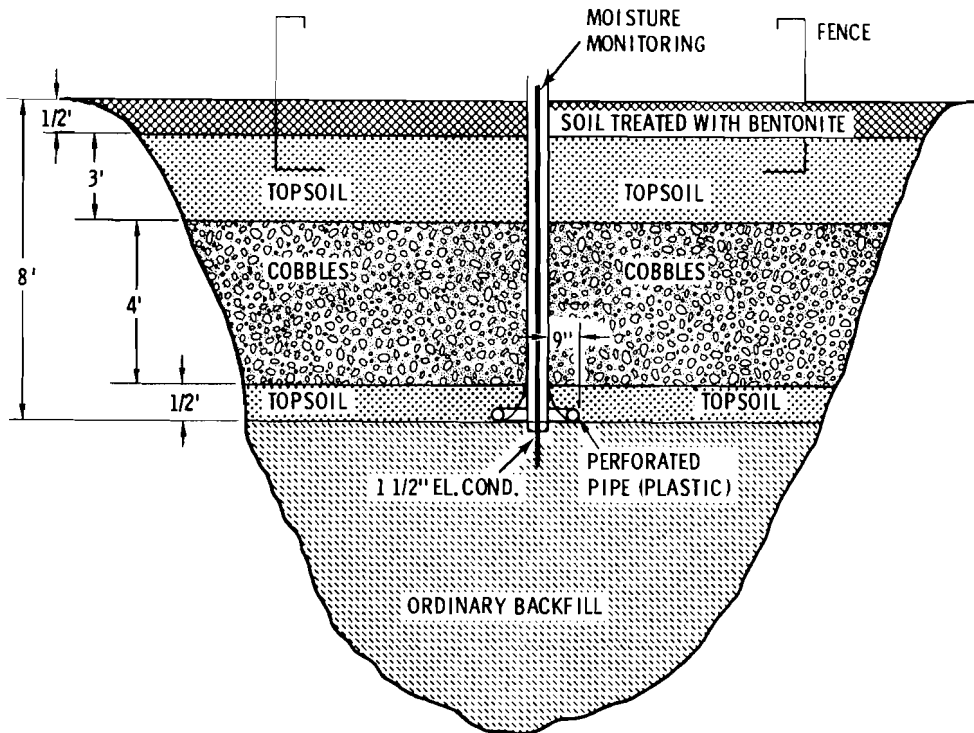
Sectional View Through Access Tube of the Trench Plot
